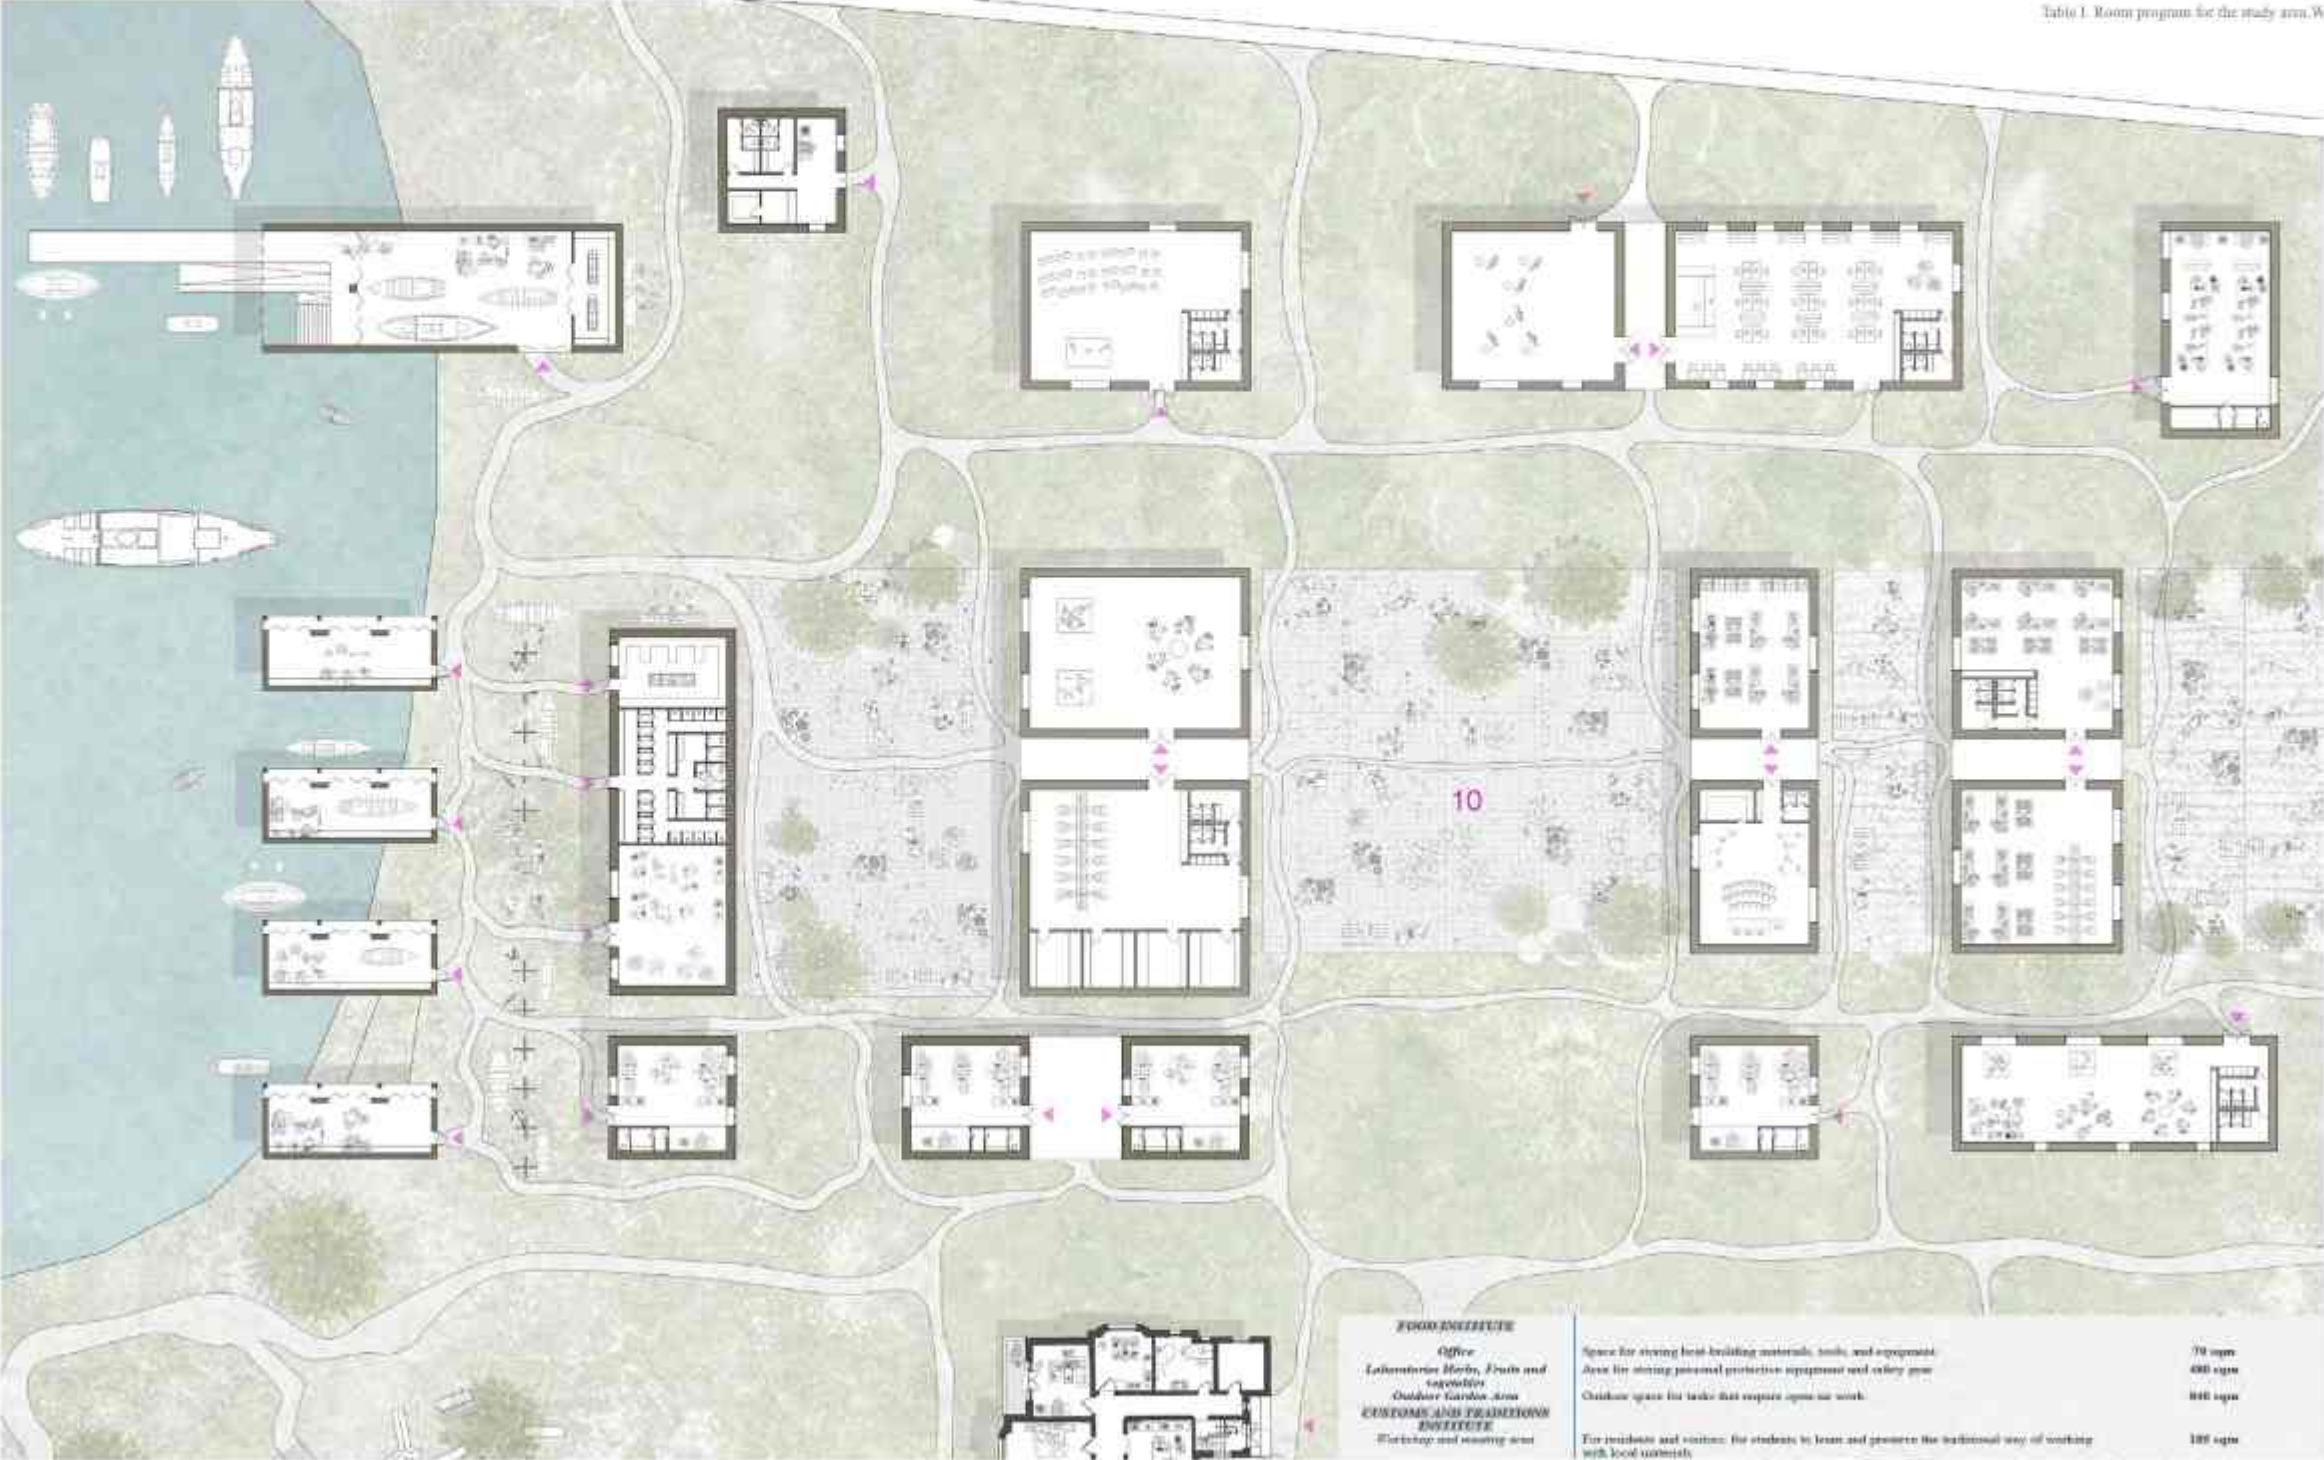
Diagram illustrating the zoom in on the floor plan for the campus.
